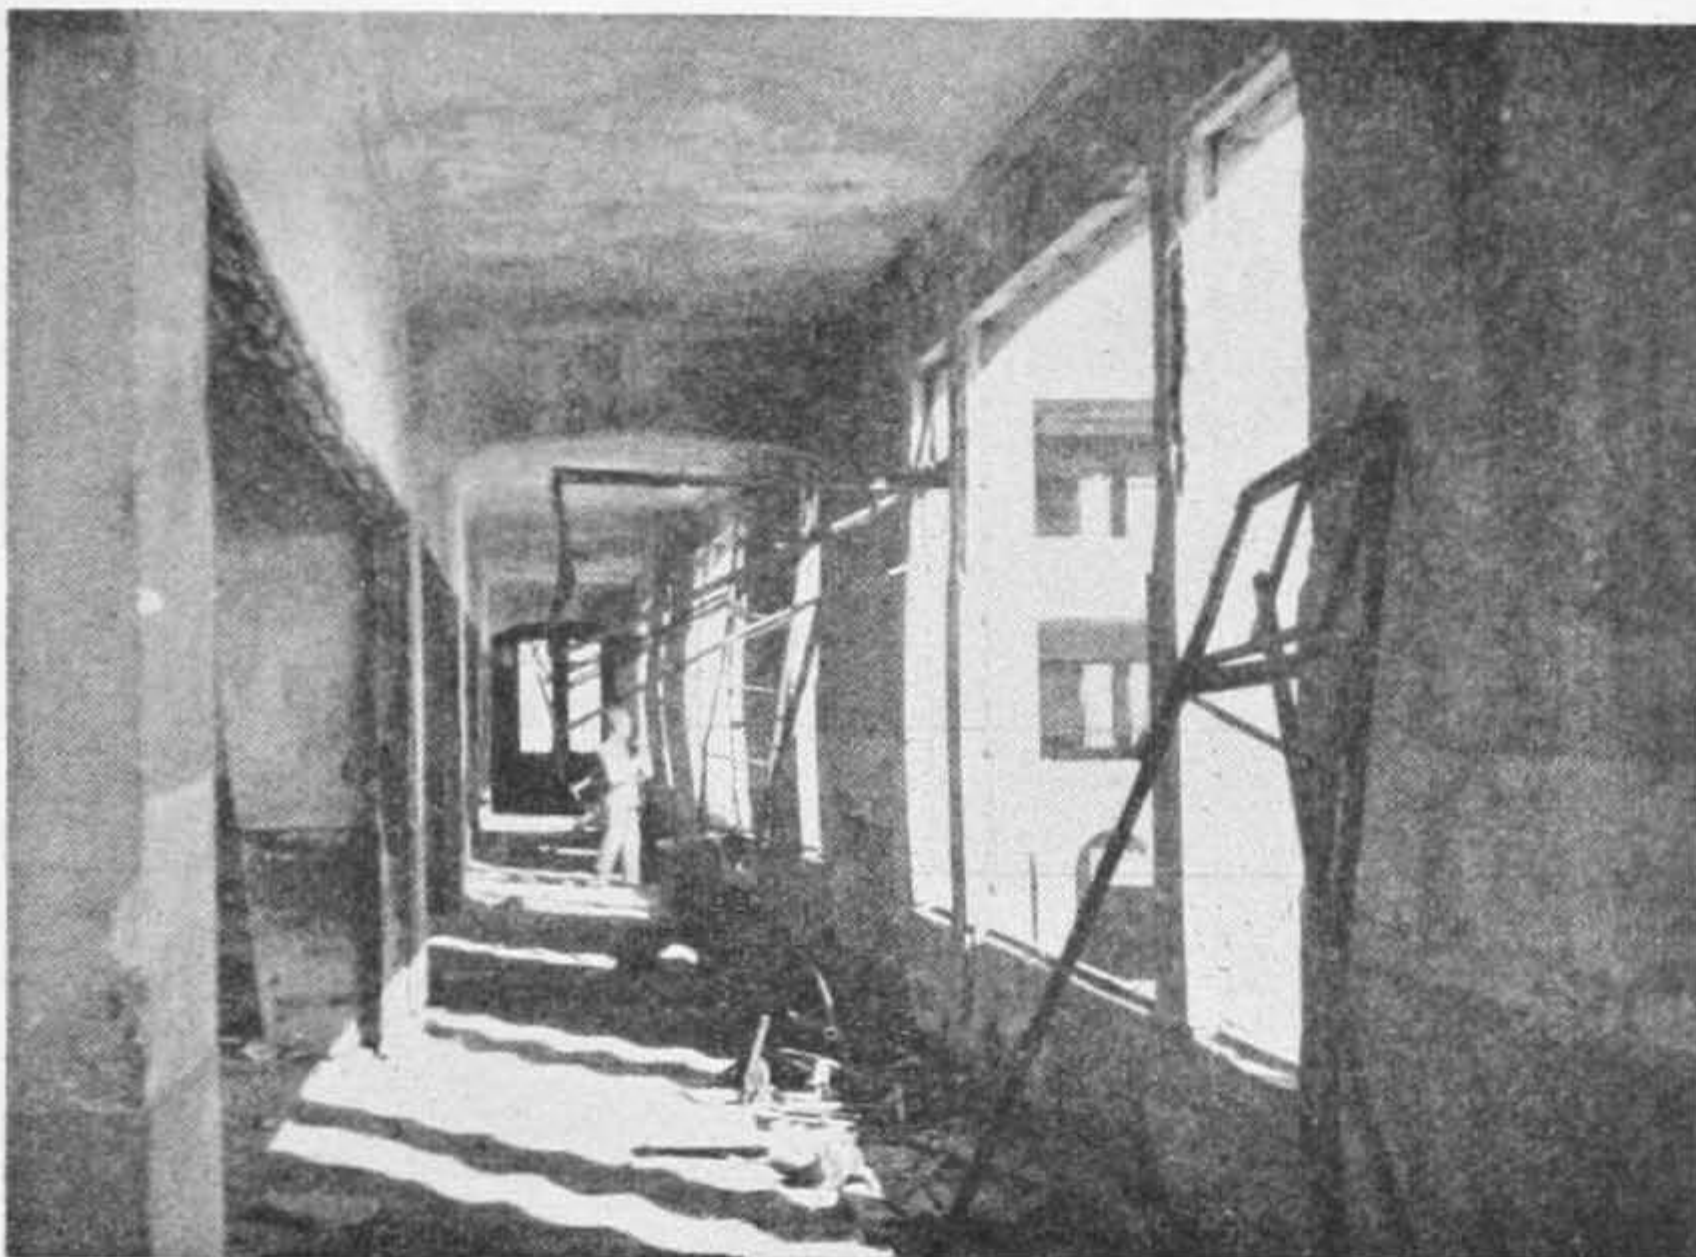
H I R O S H I M A . Reinforced concrete school 500 yds. from the centre of damage, which is to the right. The frame of this building was of special design (portal) and resisted the lateral forces. The outside walls were of continuous reinforced concrete, and although they were deflected, as seen, they did not fail.
